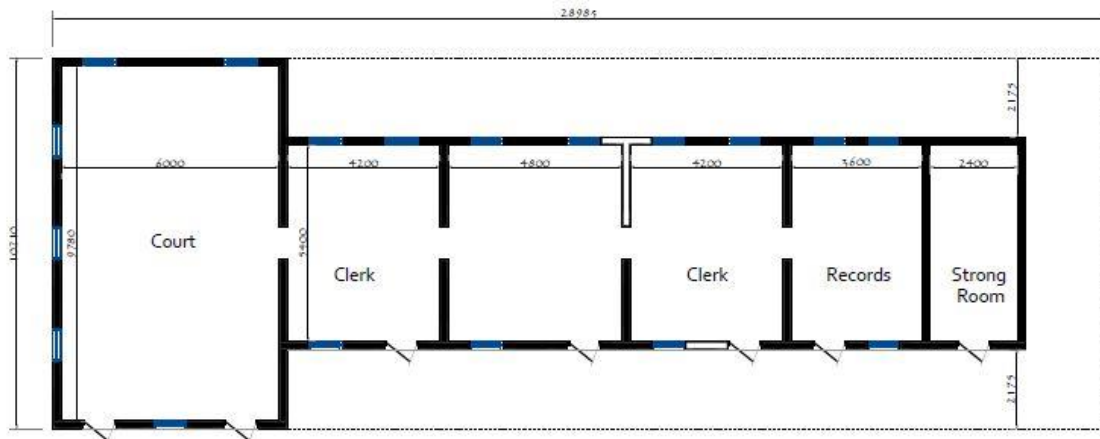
1920 Plan of Court house Kaduna<sup>416</sup>
